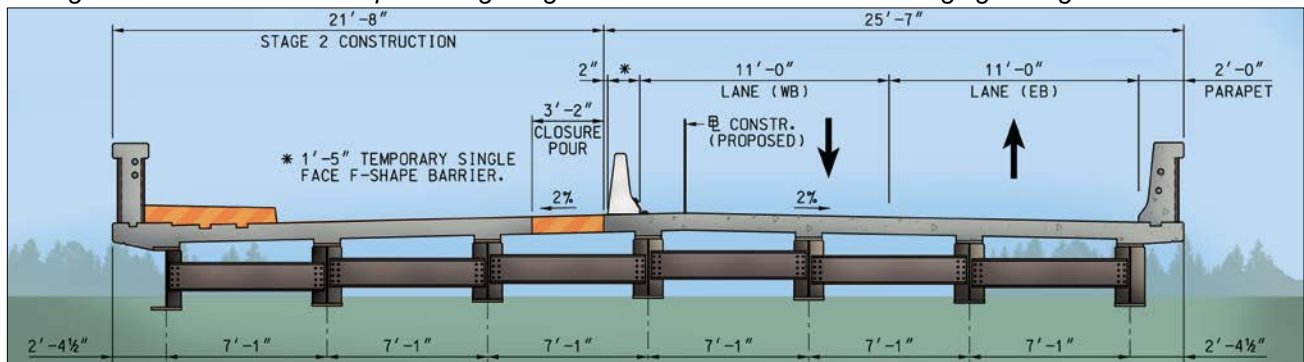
ATC 5 Triadelphia Bridge Alignment Shift and Construction Staging – Stage 2 Construction
